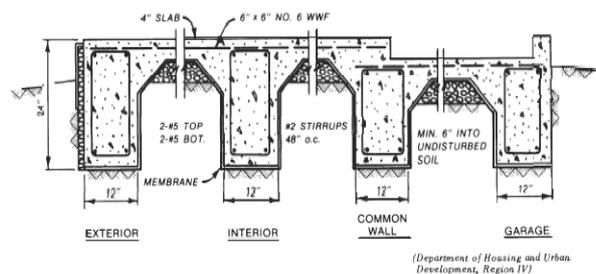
Typical conventional rebar slab in Little Rock, Arkansas, for single-family, single-story, minimally loaded frame residence with 11- to 12-foot wall spacing.
